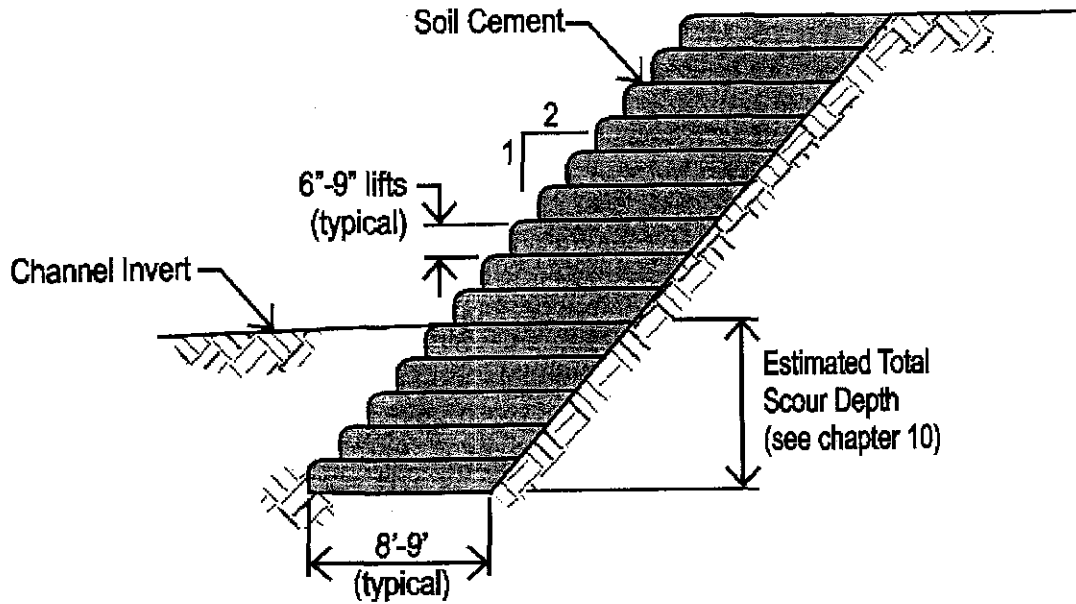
Soil Cement Placement Detail (Not To Scale)
